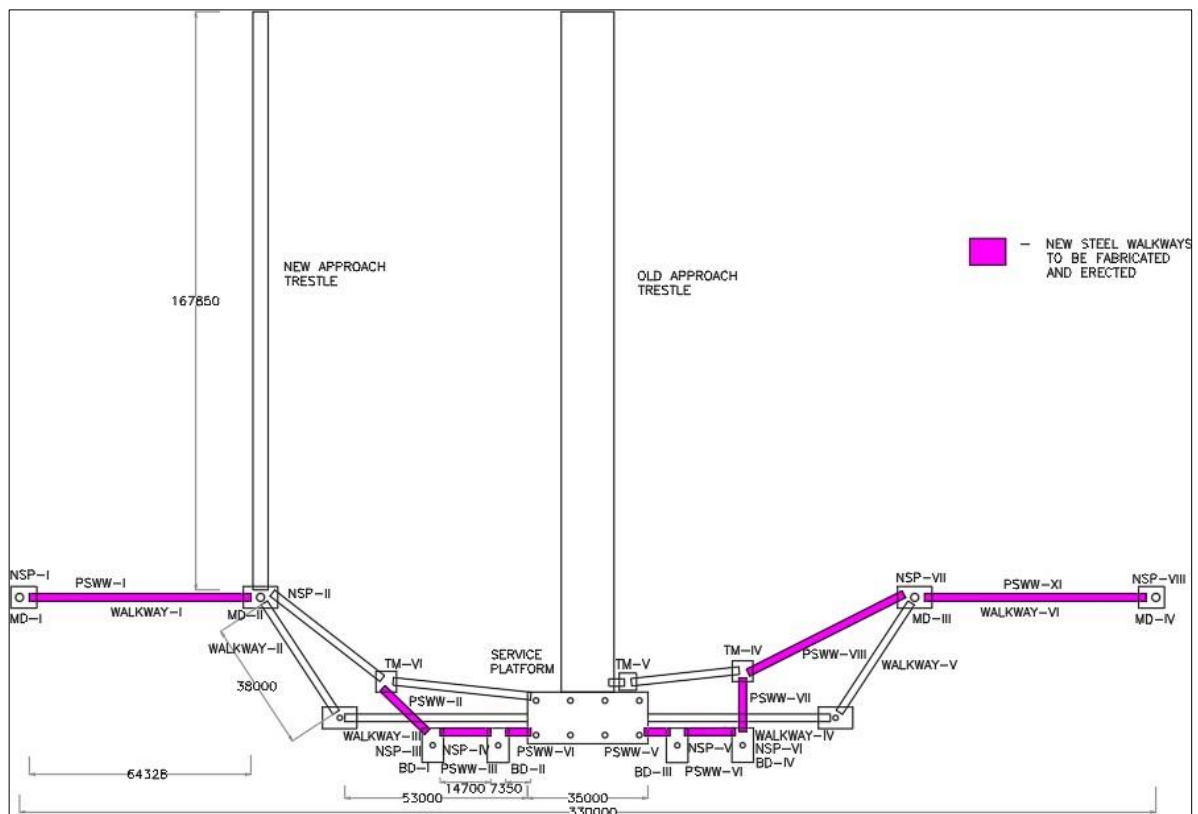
GA showing new walkways to be installed with structural steel (Dimensions are tentative)
